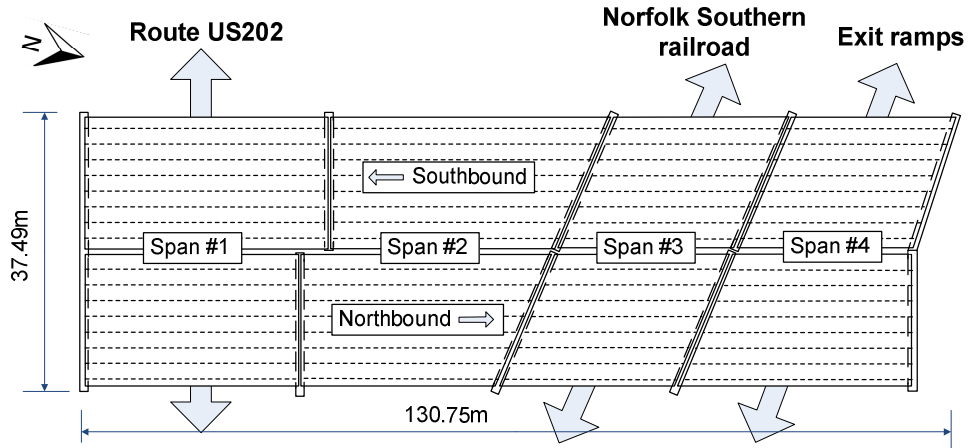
Schematic of the highway bridge (US 202 & NJ 23, Wayne, New Jersey, US)
